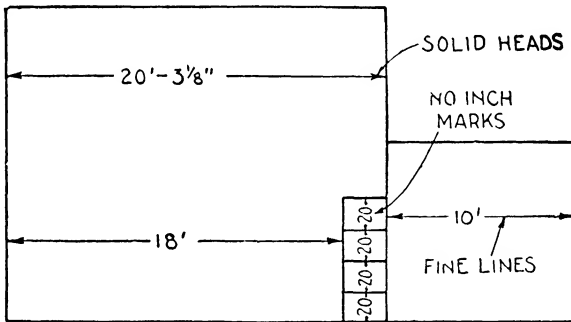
,579.—Method of dimensioning drawing as preferred by the author. Note, solid arrow heads that can be seen; fine dimension lines which by contrast are not confused with the lines of the drawing; no inch marks where dimension is in inches only.
